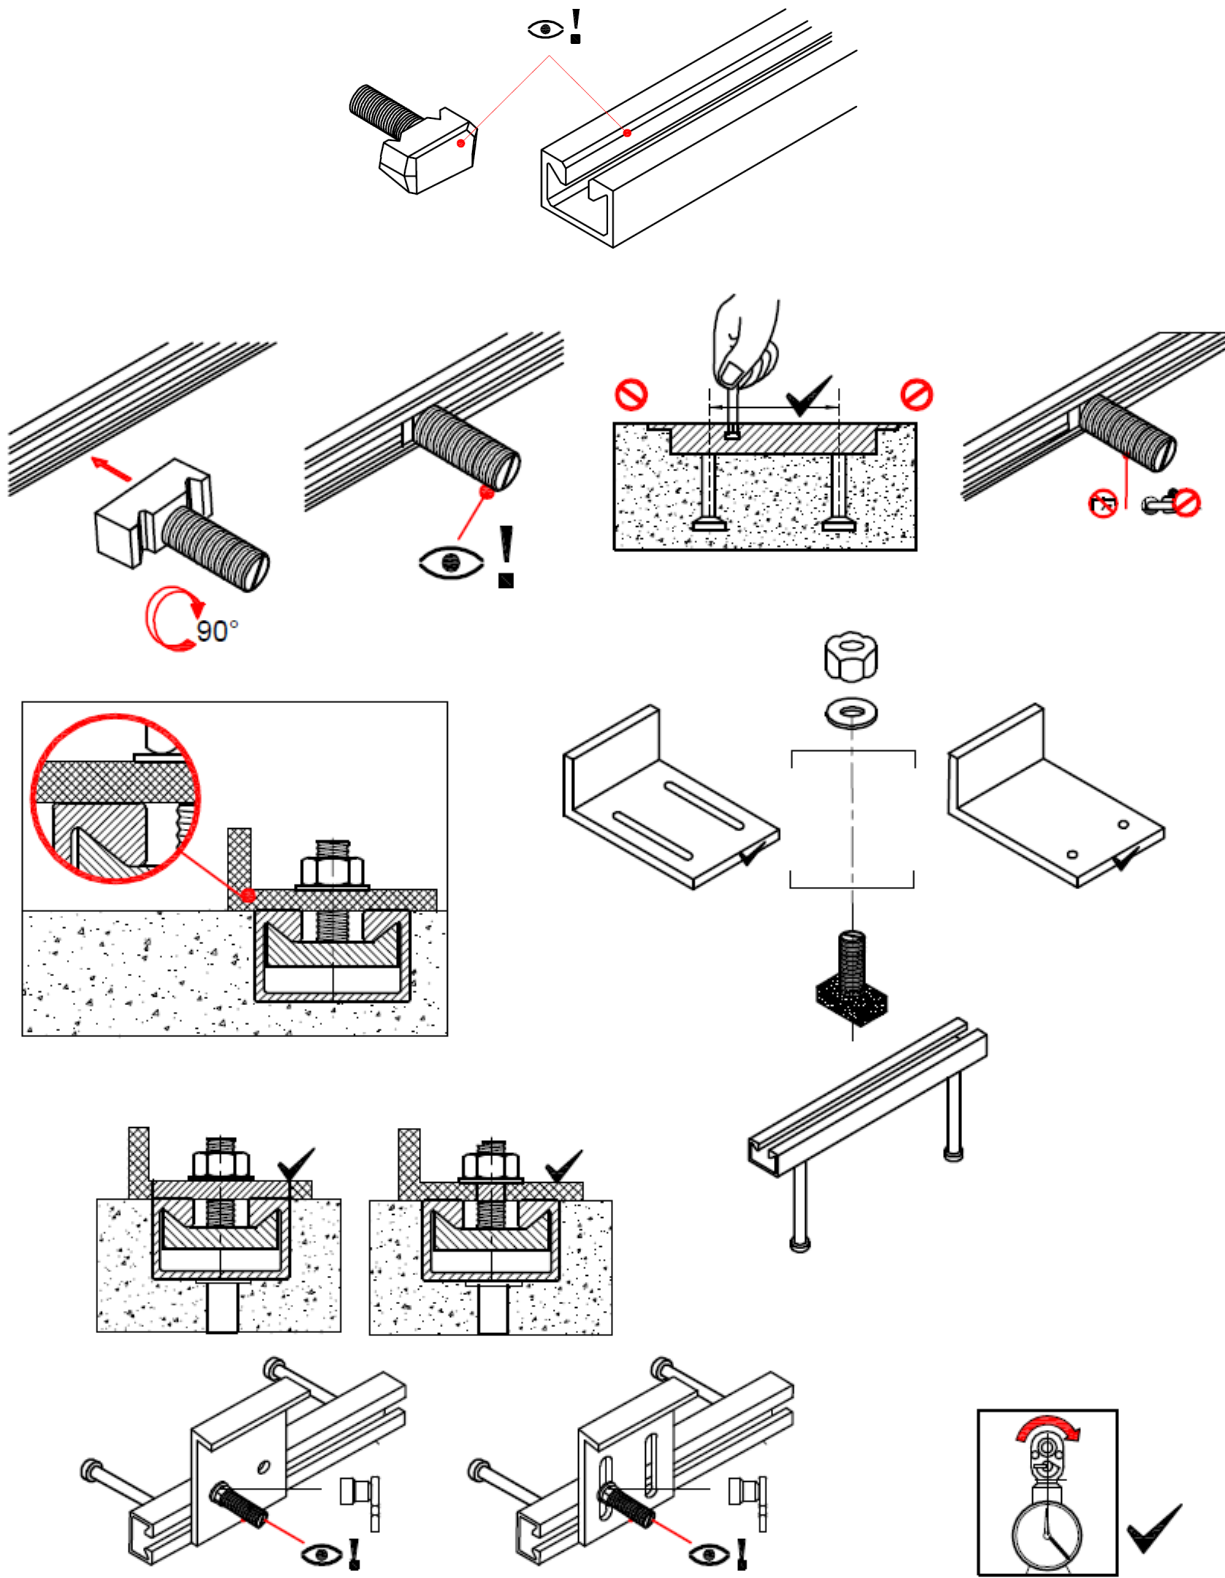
B INSTALLATION INSTRUCTIONS FOR CAST-IN ANCHOR CHANNEL BOLTS
